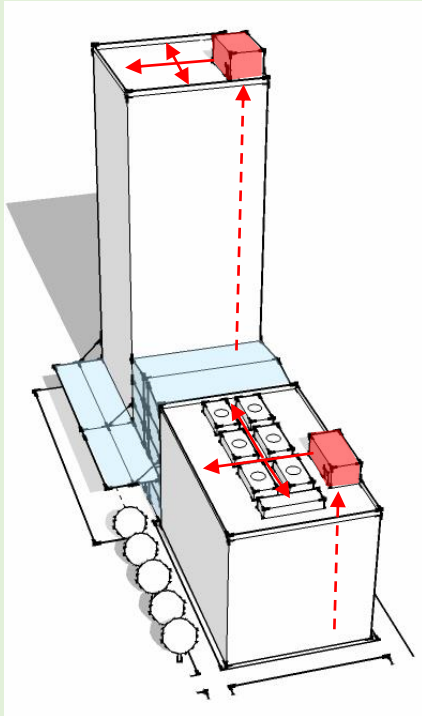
Provision of vertical access to the roof facilitates the transport of façade access equipment and parts
